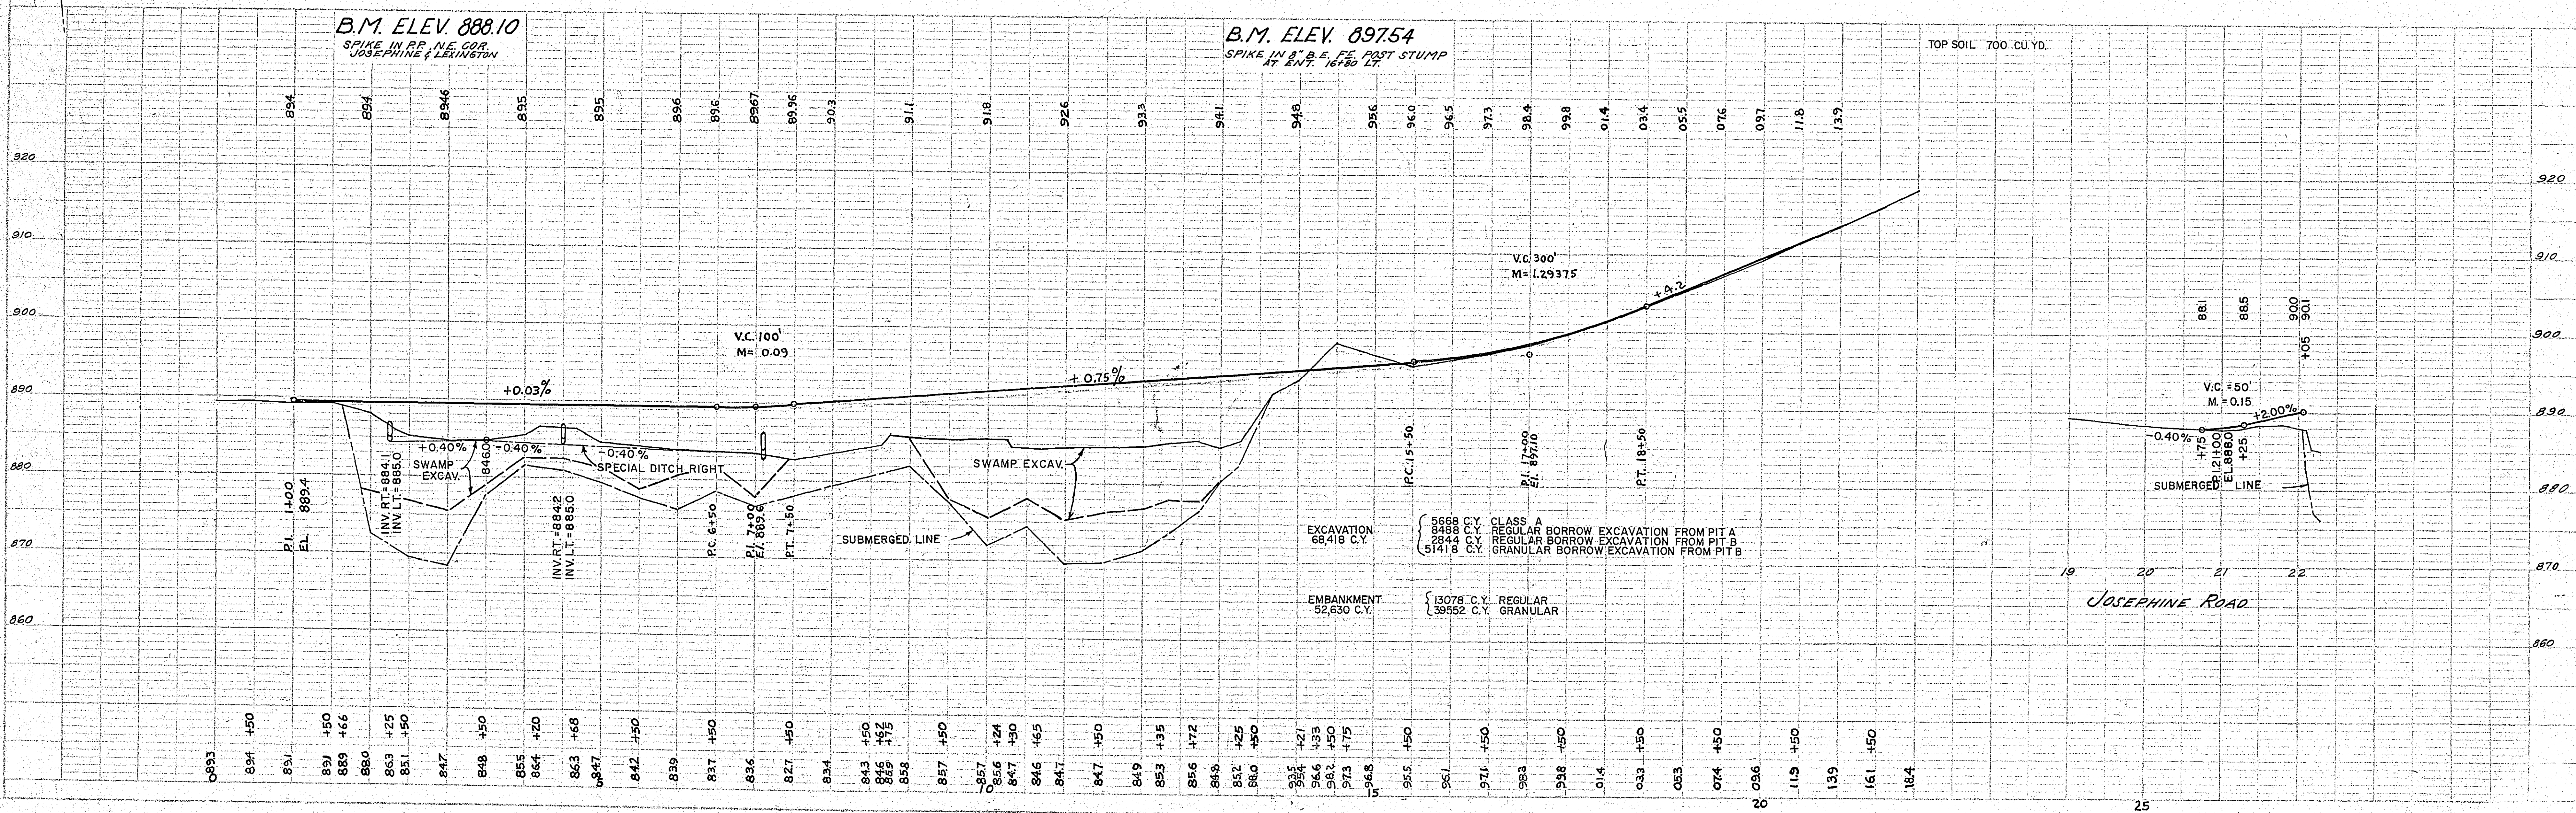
PLAN - PROFILE - 60-T.H. 10 STANDARD
